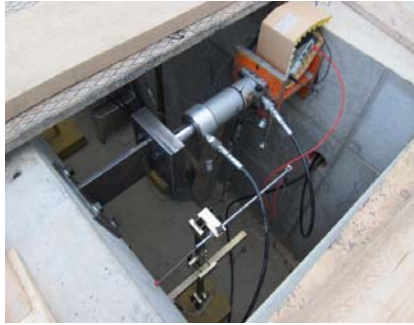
Hydraulic jack acting between the head of the slab (on the left) and the reaction wall (on the right)
